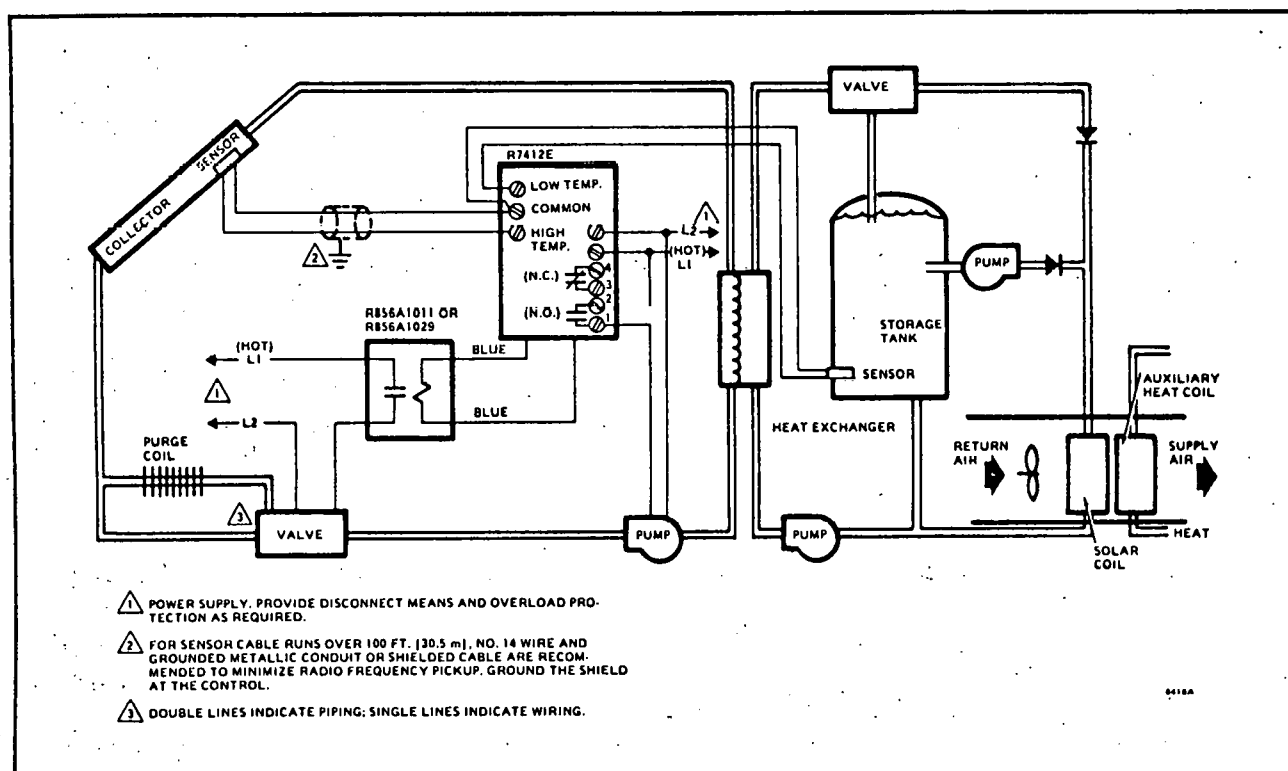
TYPICAL INSTALLATION OF THE R7412E IN A SOLAR HOT WATER TO WARM AIR HEATING SYSTEM.
